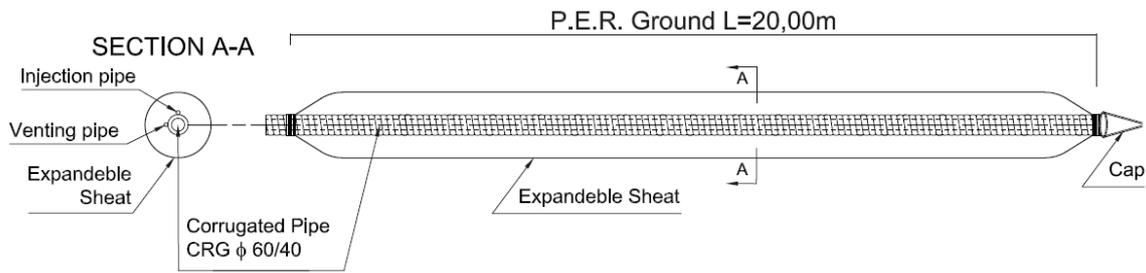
Soil nail for the tunnel face reinforcement (PERGround®, Elas Geotecnica S.r.L.)
